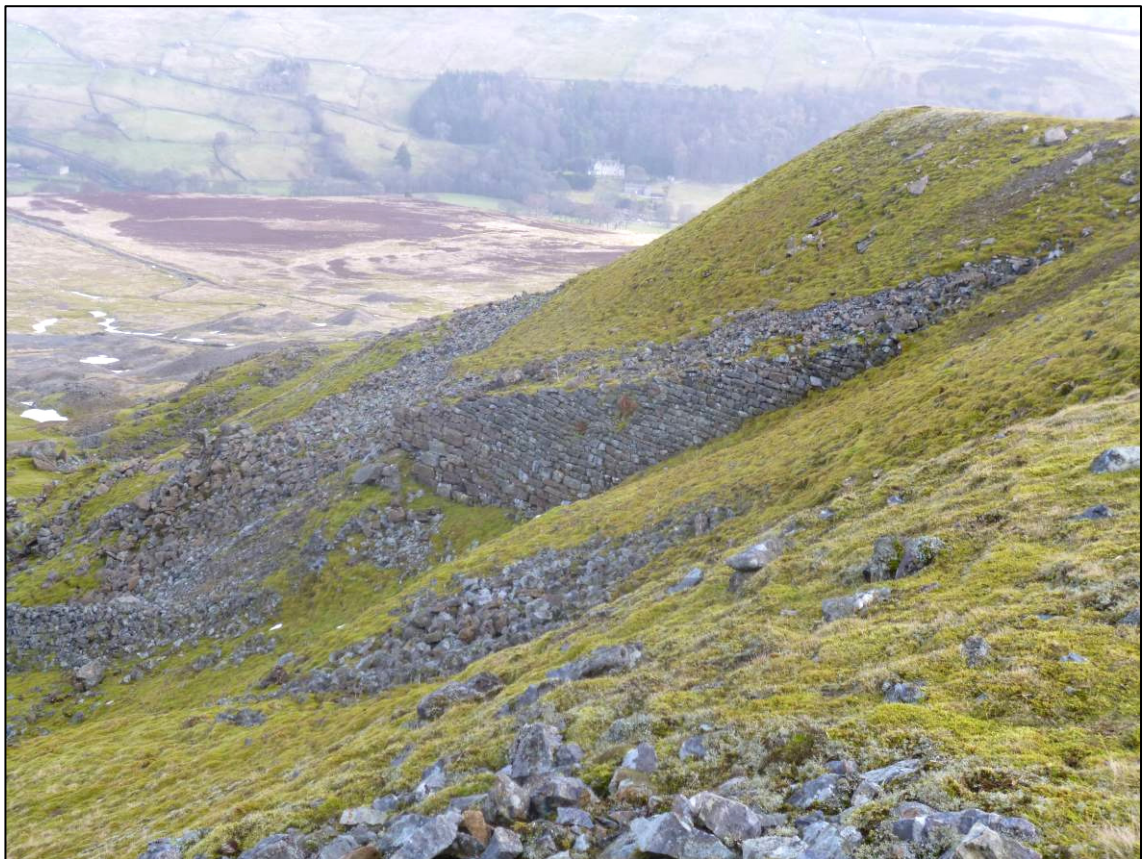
Revetted wall to upper incline (Site 11a), looking NE (photo 2/821).
